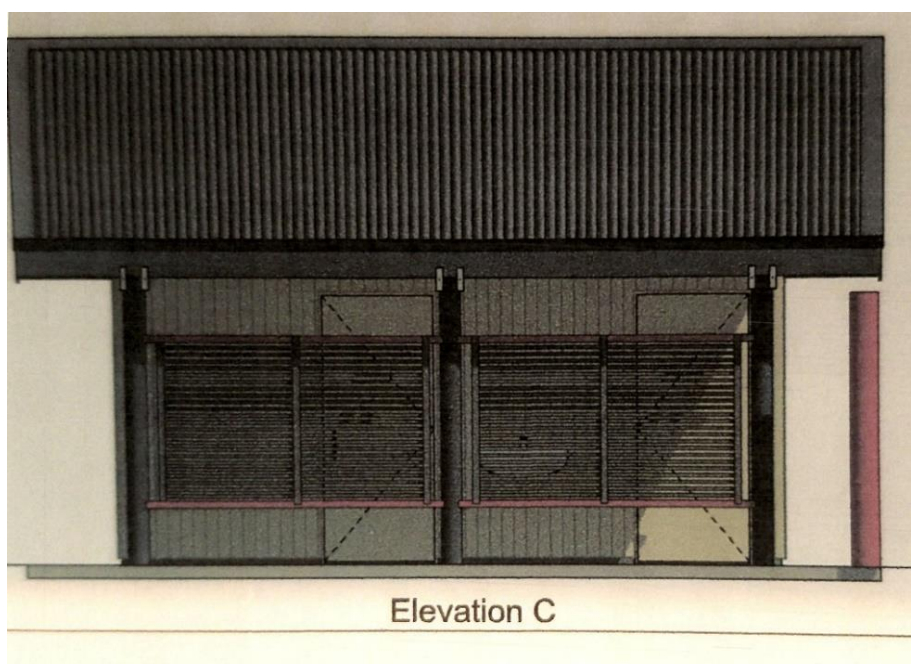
Showing elevation drawing of the proposed toilet block located at the Box Canyon Car Parking area.
